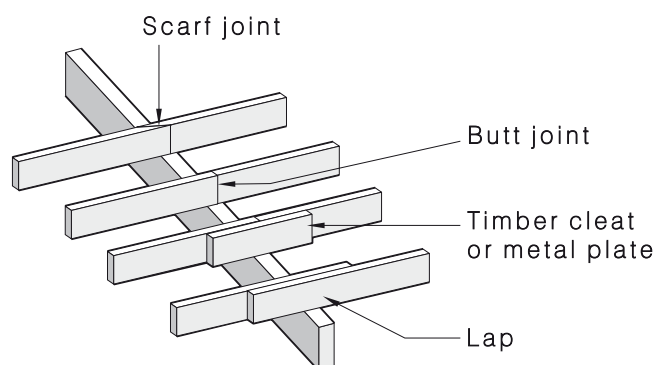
TYPICAL METHODS OF JOINING JOISTS
